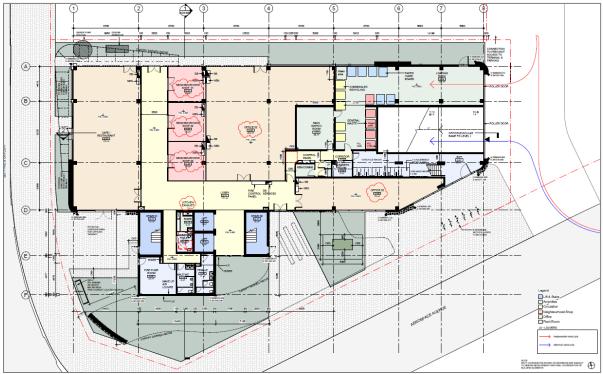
Proposed Ground Floor Layout. Source: Cox Architecture August 2022
